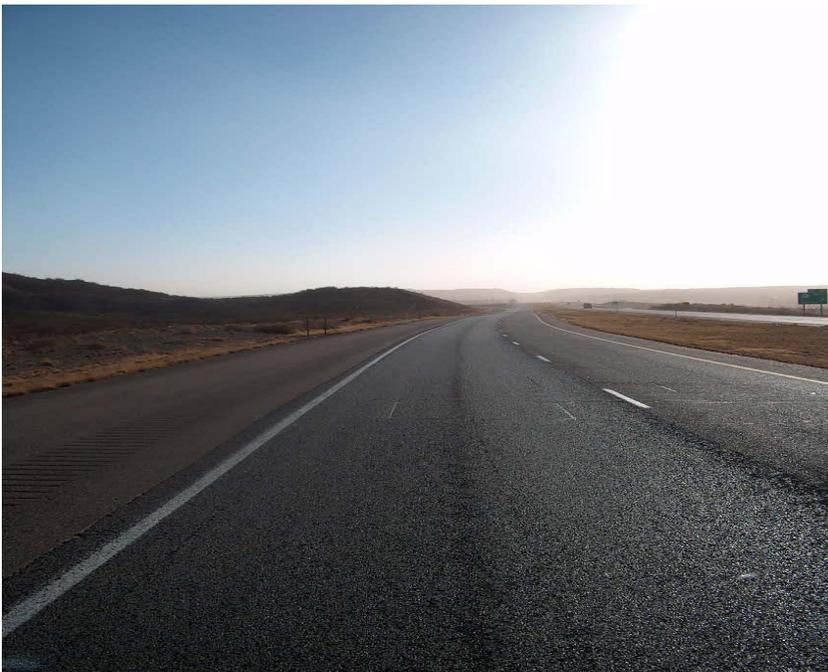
Pavement Condition of 350100 in Upstream Direction (Distress Photo 2)
